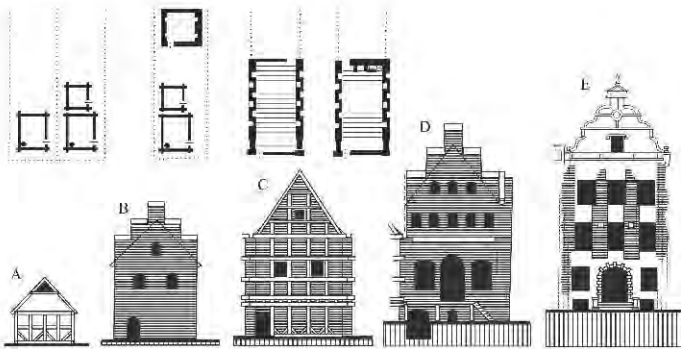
The chronology of vernacular buildings in Elbląg (Elblag): (a) free-standing timber building; (b) timber house after 1288; (c) 'Elbing' type house, compact structure separated from neighbouring property with brick walls, dating to c.1300; (d) construction of three storeys with entrance relocated to first floor, dating to after 1340; (e) frontage walls dating to the fifteenth century with seventeenth- and twentieth-century additions (aft. Nawrońska 2004)
